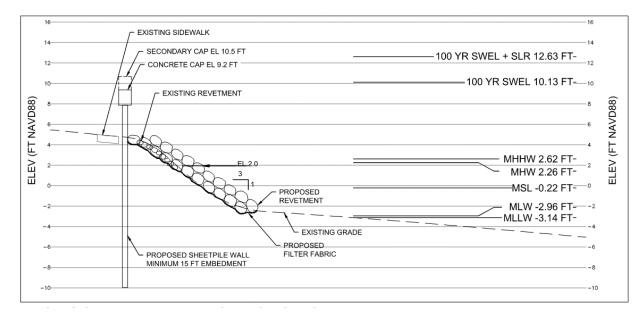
Proposed Wall and Revetment Improvements (Without Optional Sill and Living Shoreline)
